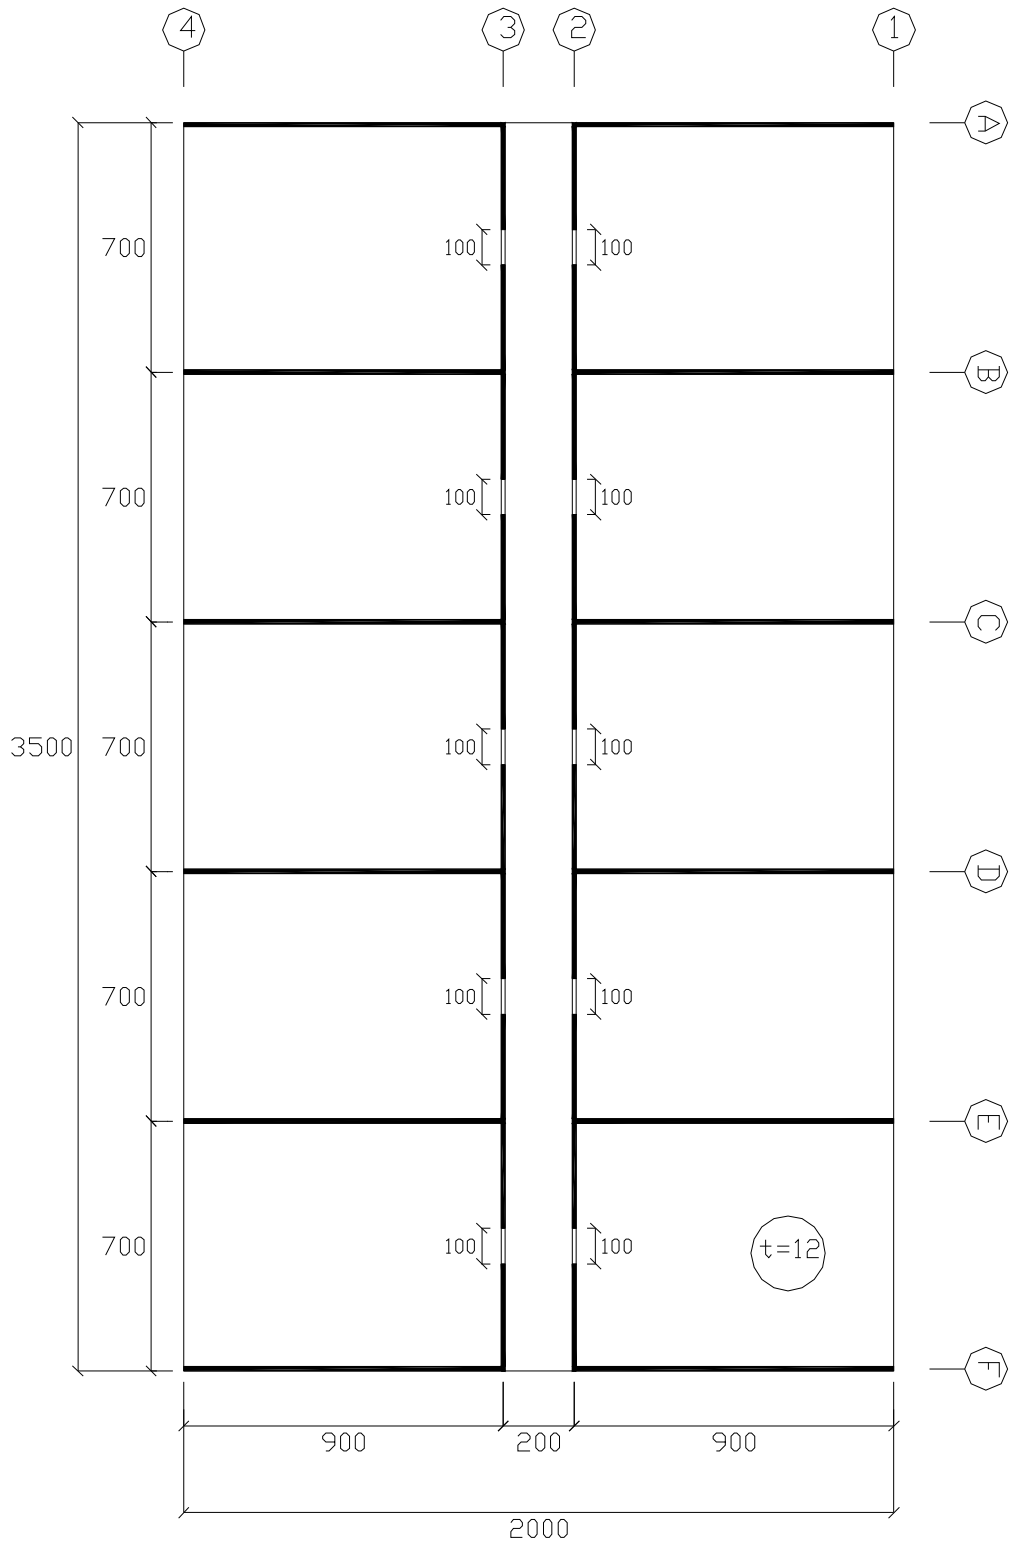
Typical plan view – Plan No. 10 (units in cm)
